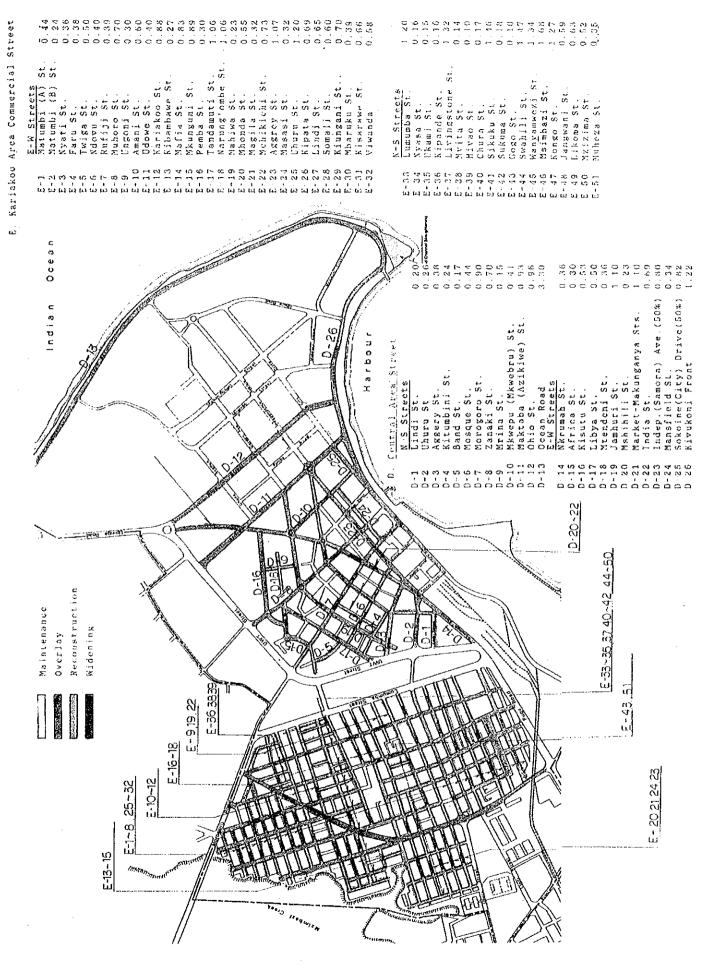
Area Roads by Improvement Measures (Central and Kariakoo Areas) S-58
